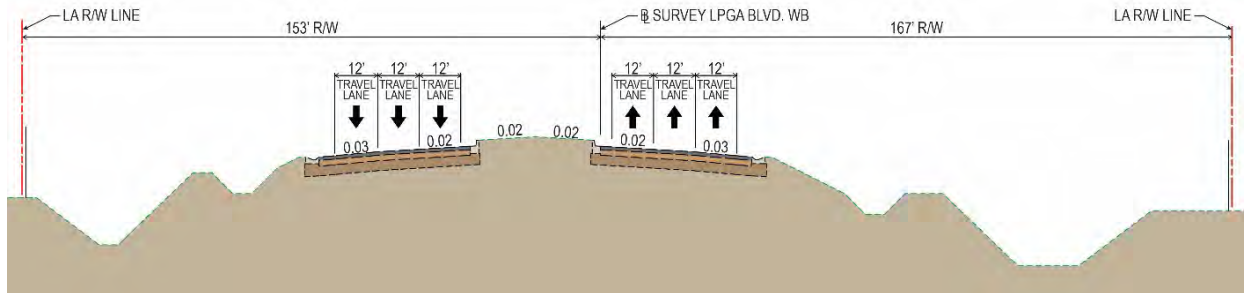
Existing Typical Section from I-95 SB Ramps to Williamson
